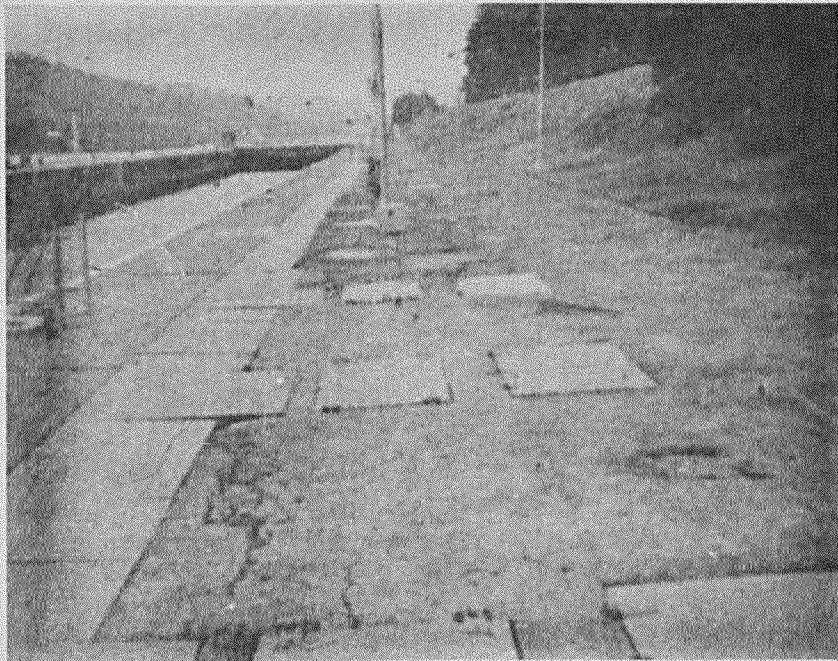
Cracking and Deterioration in Structural Slab Over Filling and Emptying Flume
